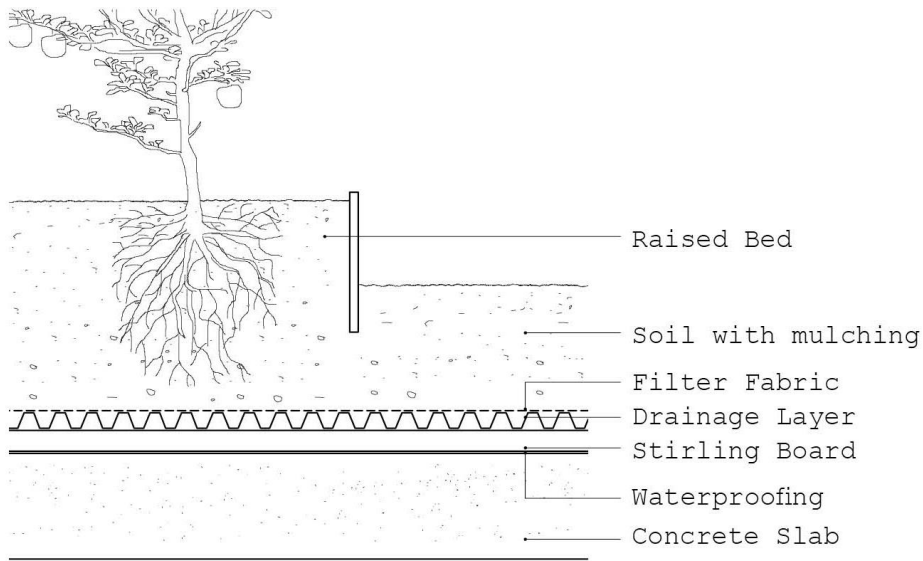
Detail of RISC Roof Garden Construction at 1:20 (Source: Author)
